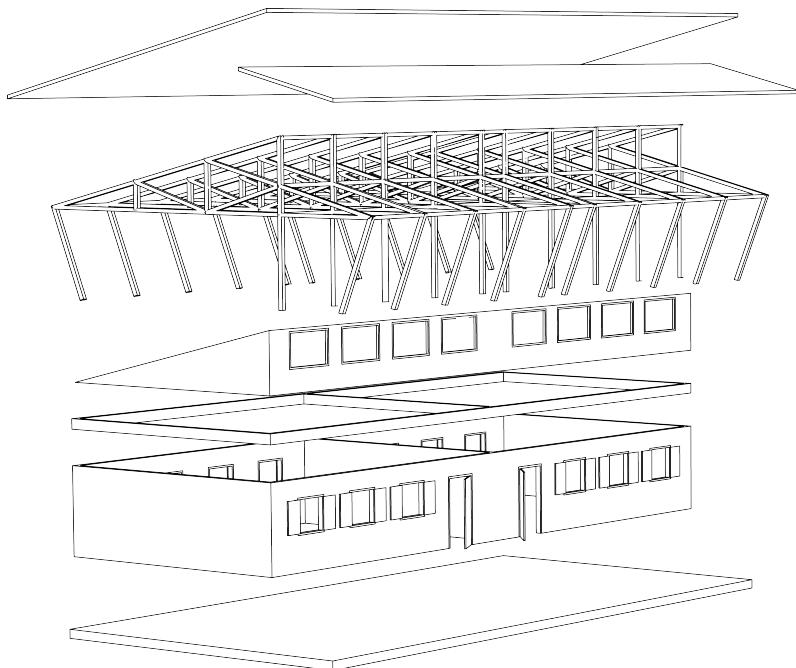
Exploded Isometric diagram of elements of school design. Bottom to top: concrete slab foundation, primary walls (integrated cross beam support), reinforcing ring beam, clerestory window and upper walls, bamboo trusses, roof (thatch and bamboo).
